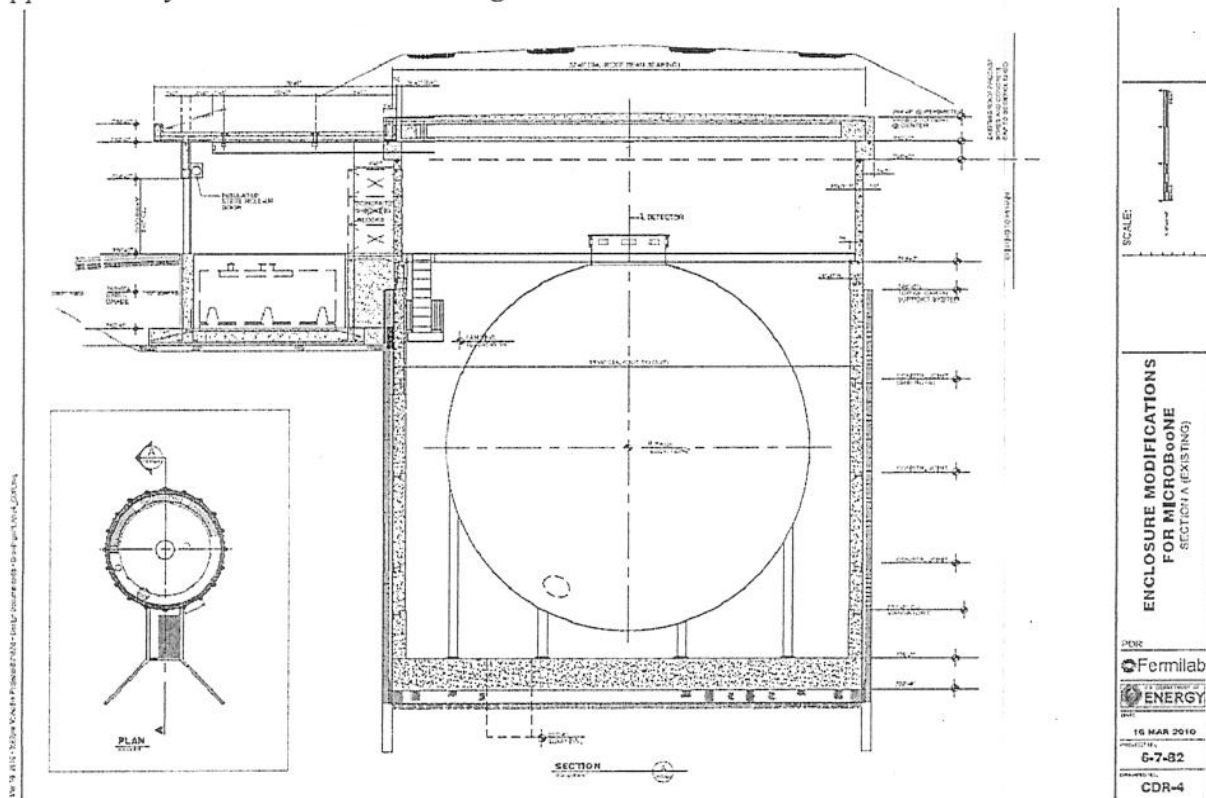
The existing MiniBooNE Detector in its concrete cylinder.
